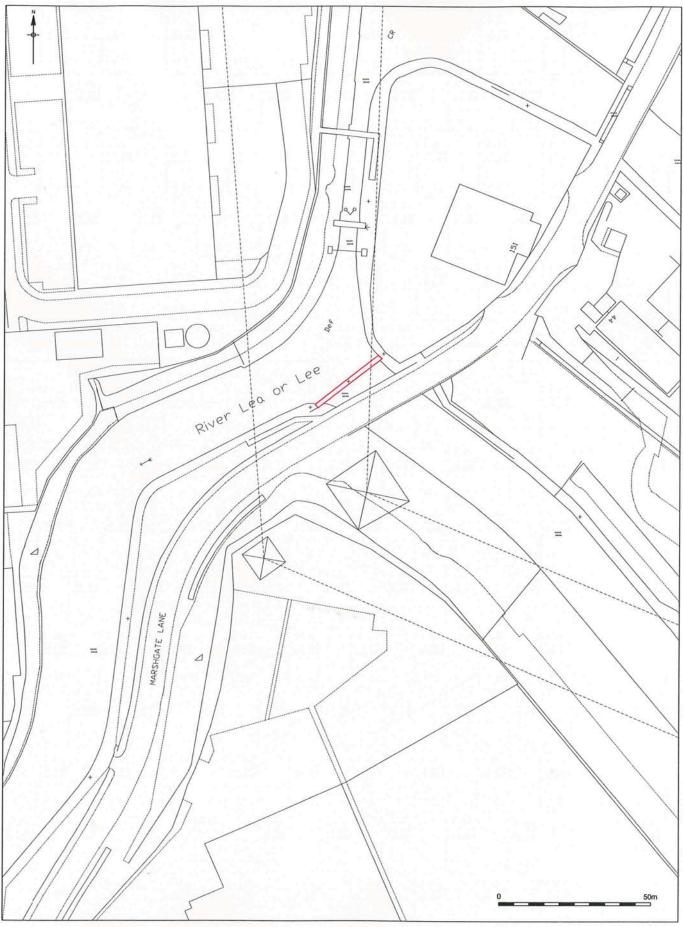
Detailed location plan: OL-07207 (Stone and brick river bank walls) 1:1,250 at A4
